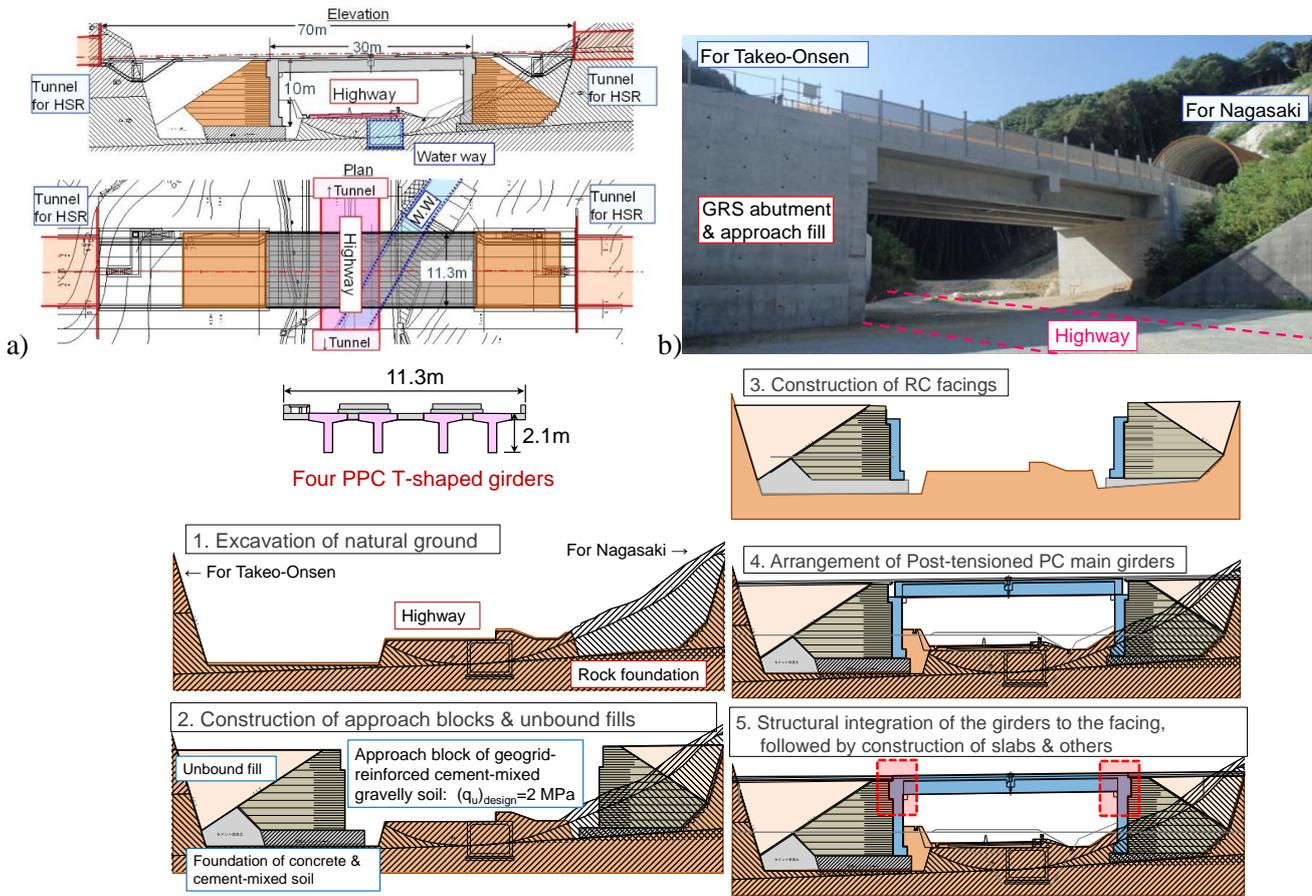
GRS Integral Bridge at Genshu, Nishi-Nagasaki Route, Kyushu Shin-kan-sen: a) structure; b) completed bridge; c) cross-section and construction procedure (Soga et al., 2018).
